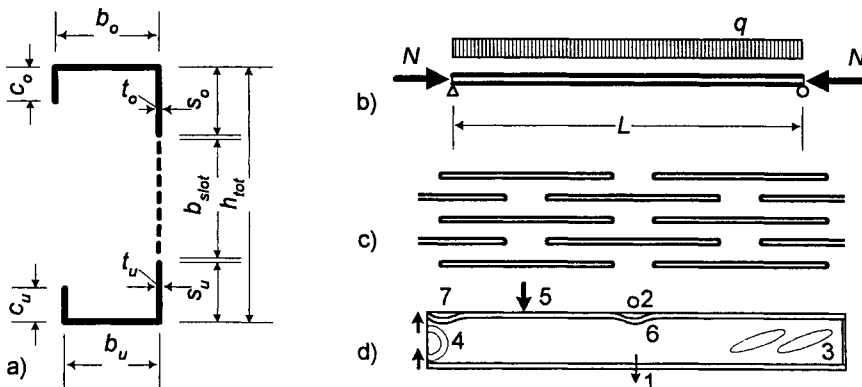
Slotted stud. a) cross section, b) loading, c) slots, d) failure modes.
